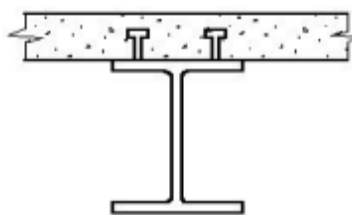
Typical composite beam: steel section connected to a concrete slab on top by headed studs[1]
